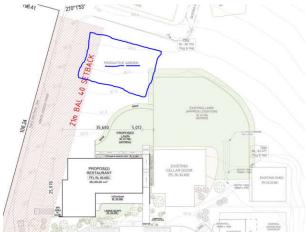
Approved plan P223450 shows 690sqm productive garden beside the restaurant.
